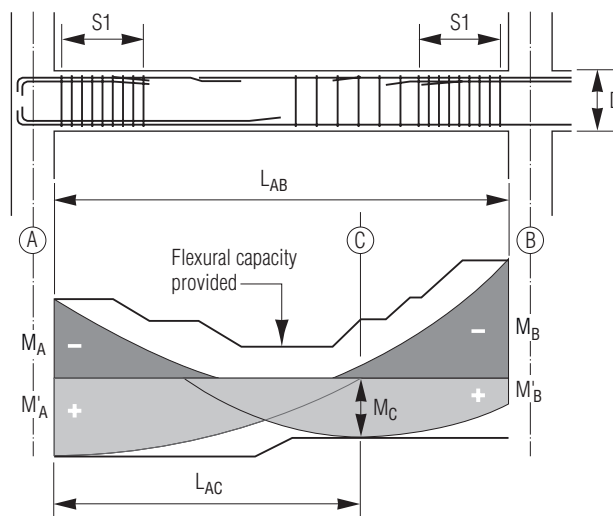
Typical Beam Restraint Details for IMRF Structures
